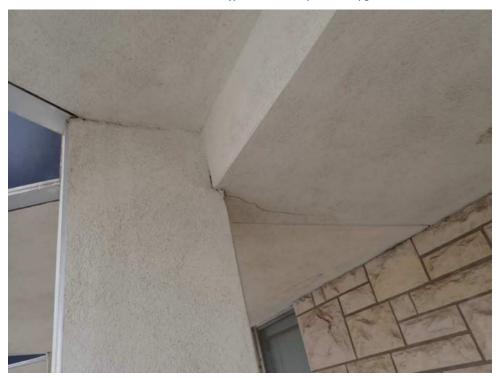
Cracked Stucco Soffit Above Sidewalk at Orr Hall, Typical Elsewhere
